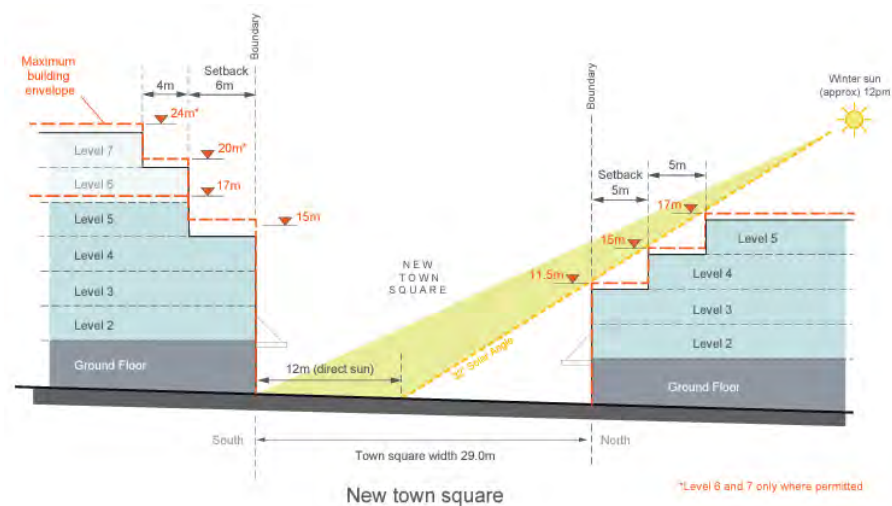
Section illustrating building envelope applicable to land to the north of new town square on eastern side of Great North Road and expanded Fred Kelly Place on western side of Great North Road (Part F, Section D, page F-157)
